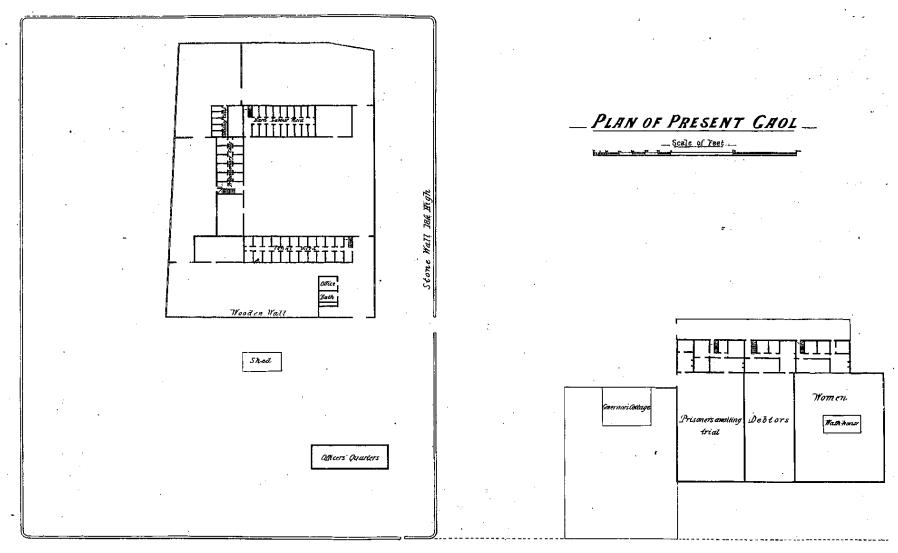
1877 plan of Stockade (AJHR 1877: Session I, H-30 p.11)
